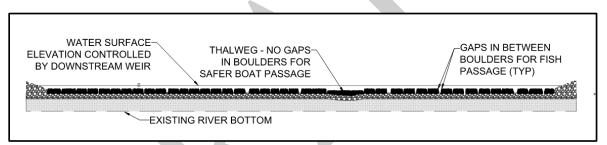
Partial Dam Removal - Cross Section of Rock Arch Rapids Weir
